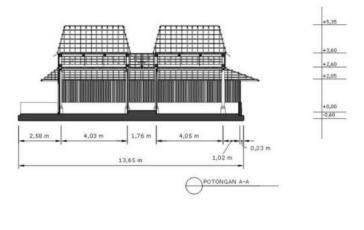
Section of the Taneyan Lanjhang house building Source: Research team, 2023
